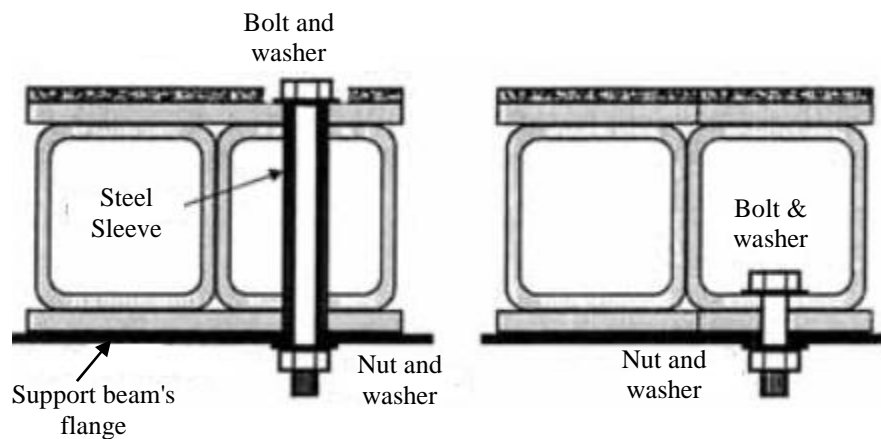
Connection of pultruded bridge decks to beams' flanges using mechanical fasteners
